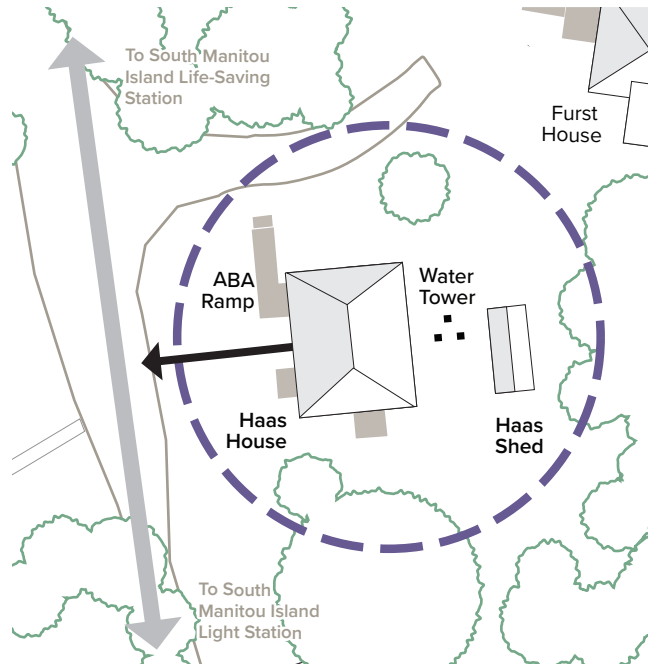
The Haas House is set within a small clearing with its primary facade oriented west to the South Manitou Visitor Center and a route connecting South Manitou Island Life-Saving Station to South Manitou Island Light Station (source: Mundus Bishop, 2025).
